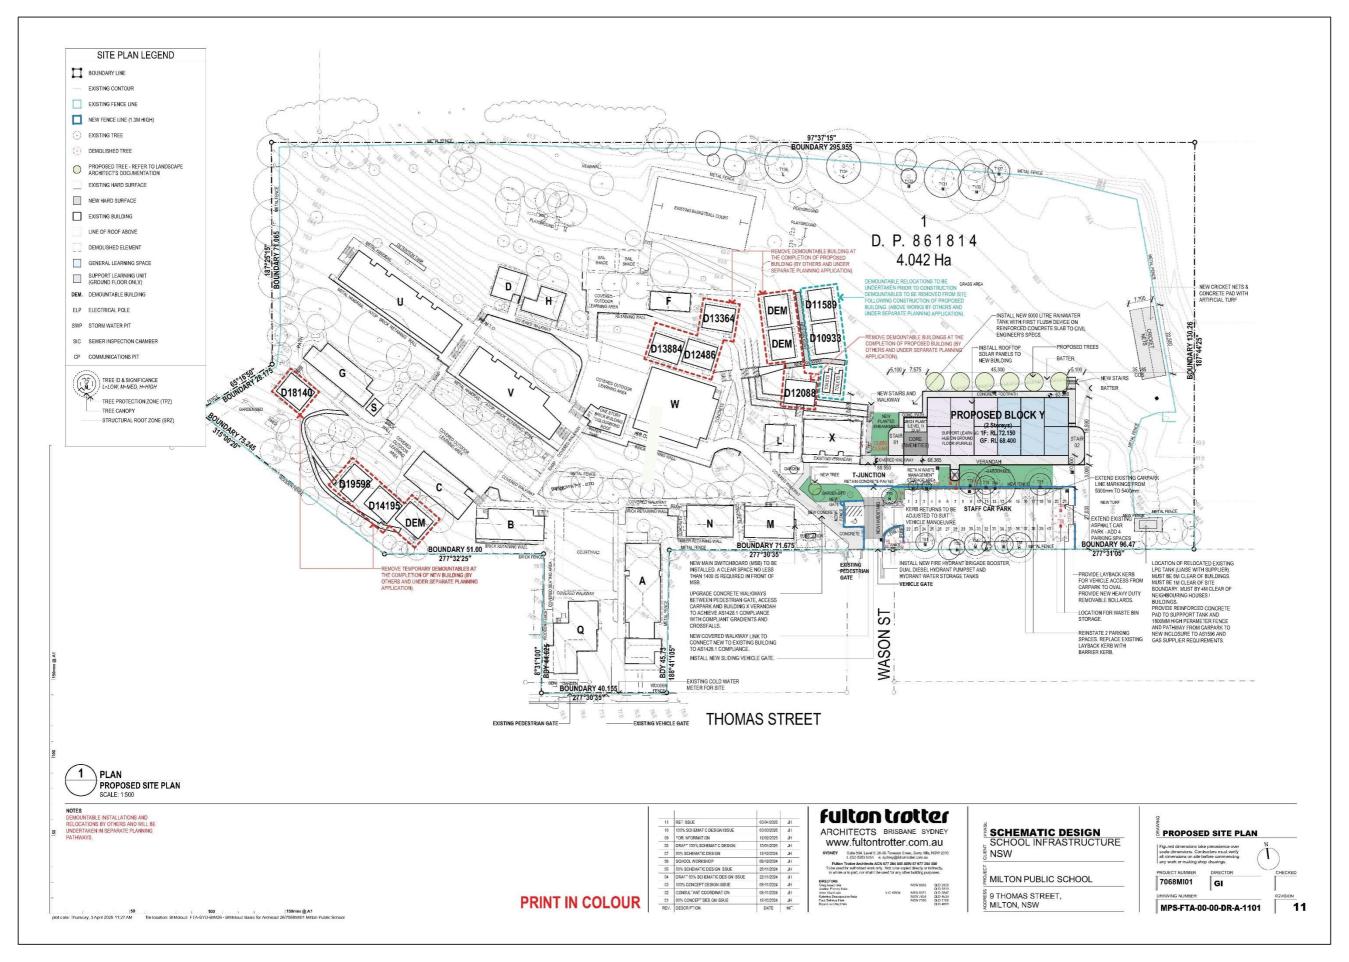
Site Plan (Source: Fulton Trotter 2025)
